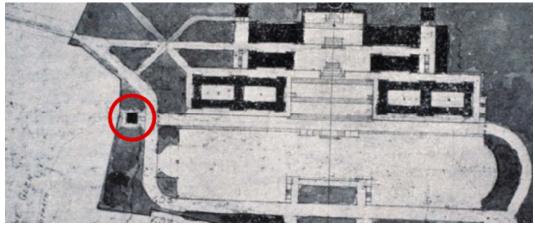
Solomon's plan showing a building terminating the southern end of what would now be Rugby Road. This is the only building on Solomon's plan terminating a southern lateral axis. (UCT Archives & Manuscripts).
